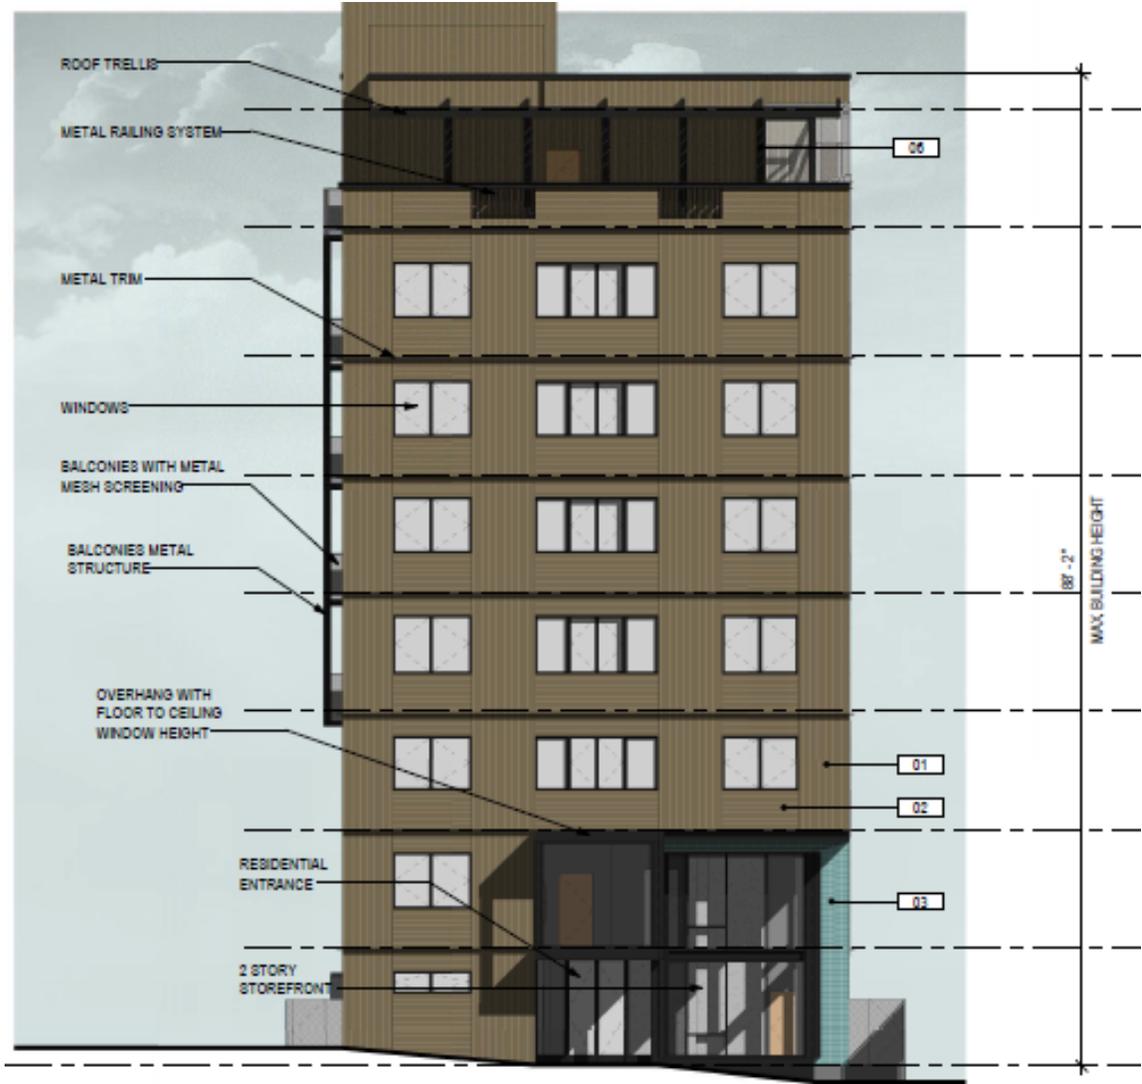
2660 Bancroft Way (Multifamily Building) South Elevation
